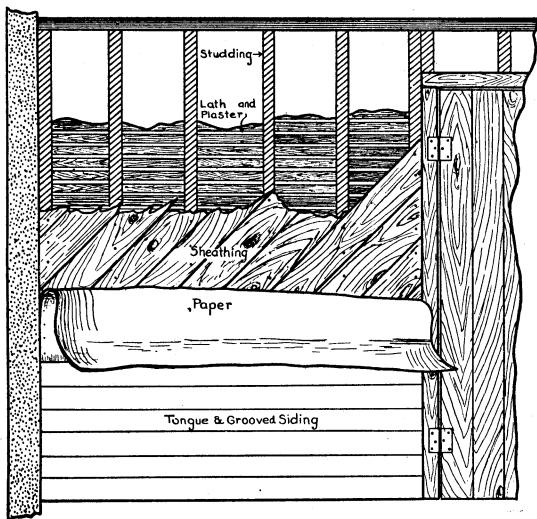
Wall of a storage room in a basement, showing the details of construction. This type of construction is good, but a satisfactory room can be made by omitting the laths and plaster. Many rooms with studing frame and tongue-and-groove siding give excellent results.
